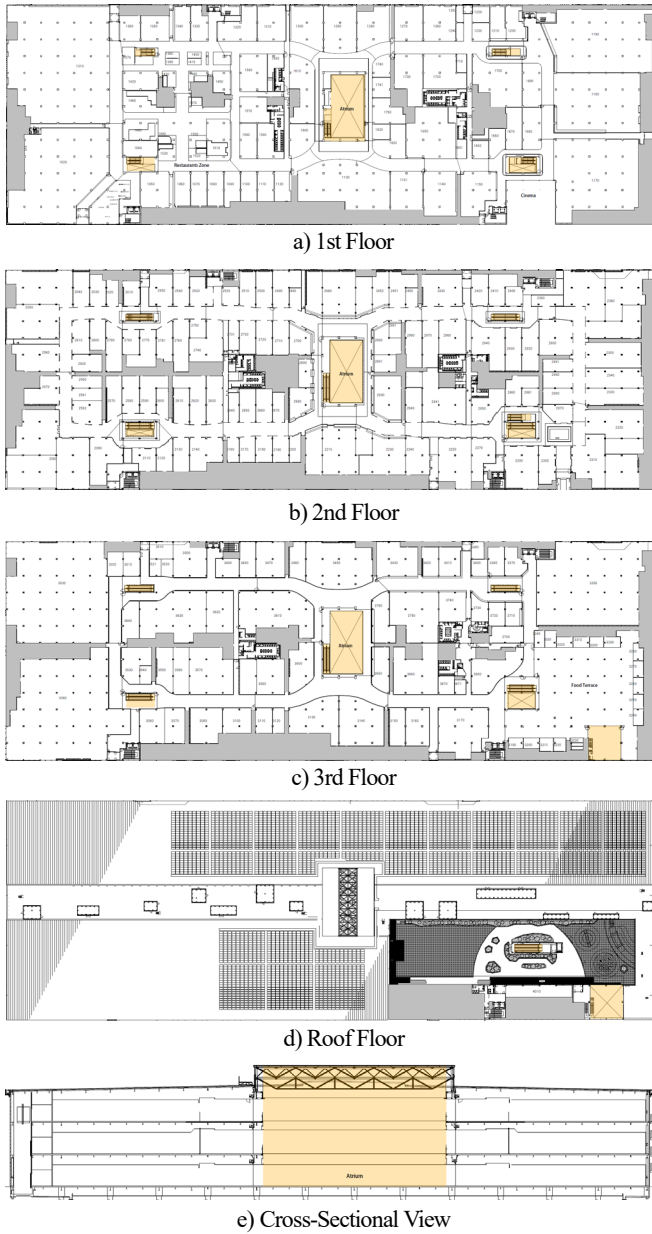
Floor Plan and Cross-Sectional View of the Facility
